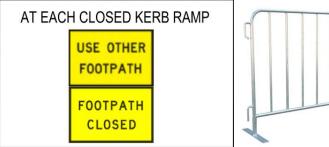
Pedestrian Ramp Closure near Cope Street / Wellington Street Roundabout
